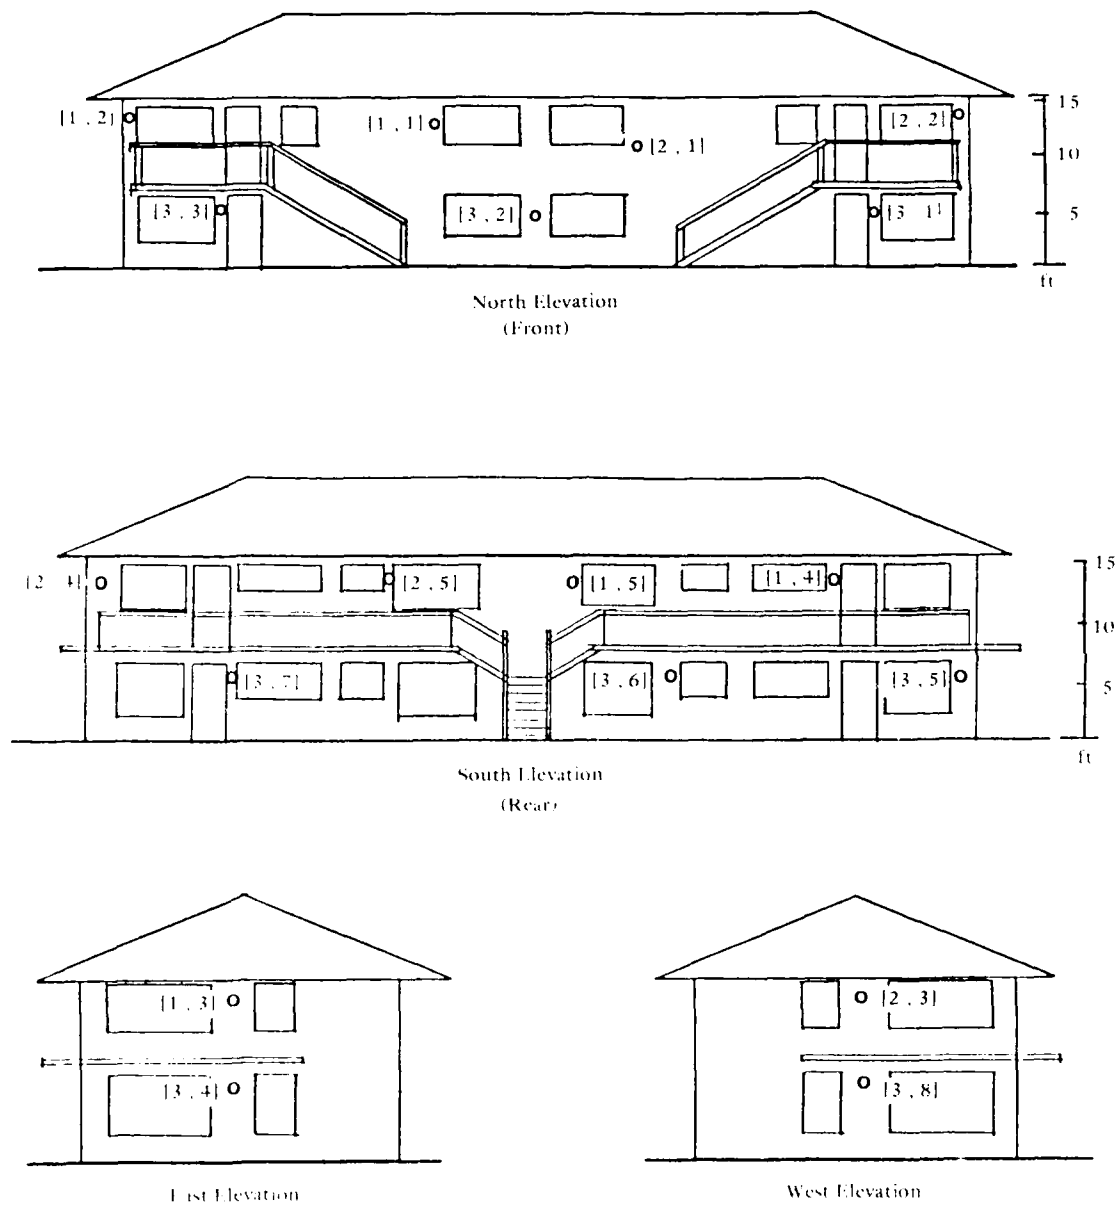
Elevation plan of Building No. 3 with the pressure taps locations shown.
